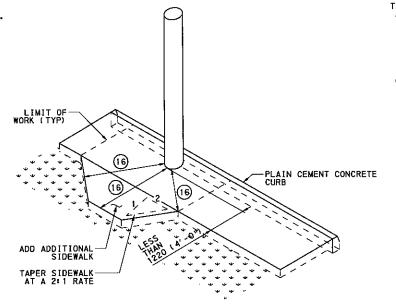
DETAIL ILLUSTRATES A TYPE 1 EXISTING RAMP REPLACED WITH A TYPE 2 RAMP. USE THIS DETAIL AS AN EXAMPLE TO REPLACE ANY RAMP WITH A DIFFERENT CURB RAMP TYPE.
